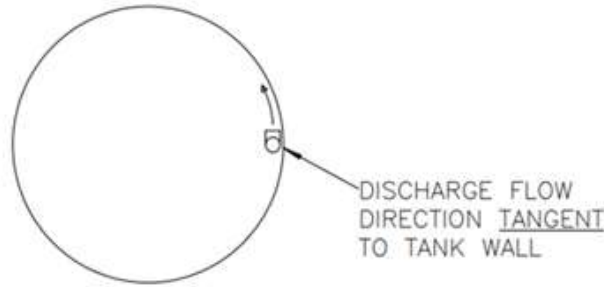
Plan view of INDALO discharge layout in a flooded suction installation.
